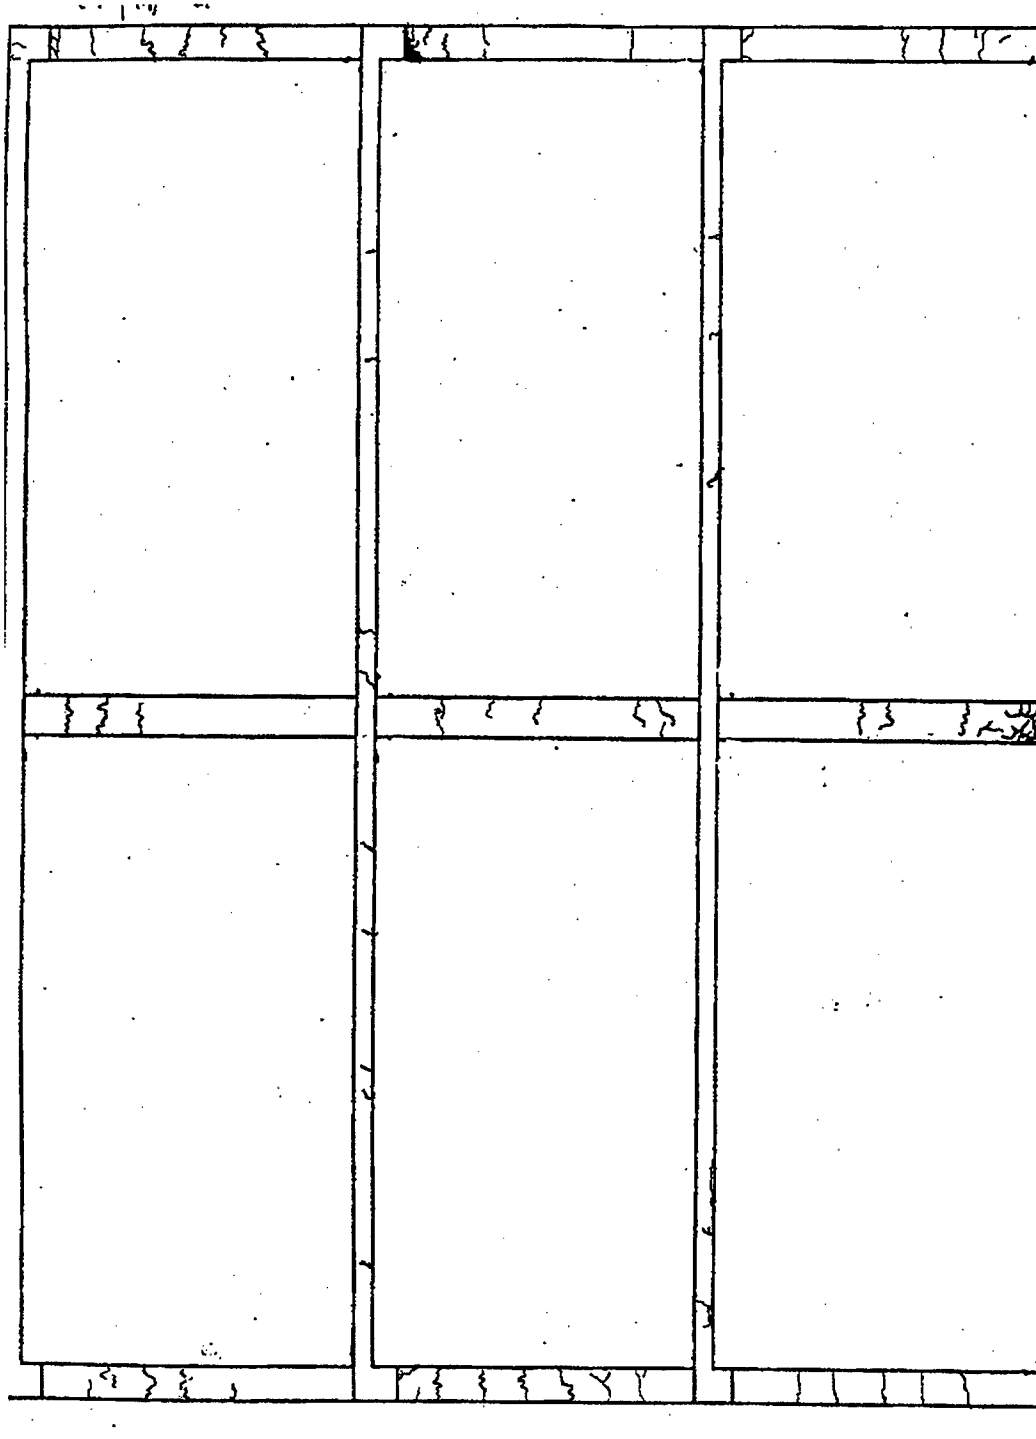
Crack Pattern, West Side of West Columns, Post-E200N
